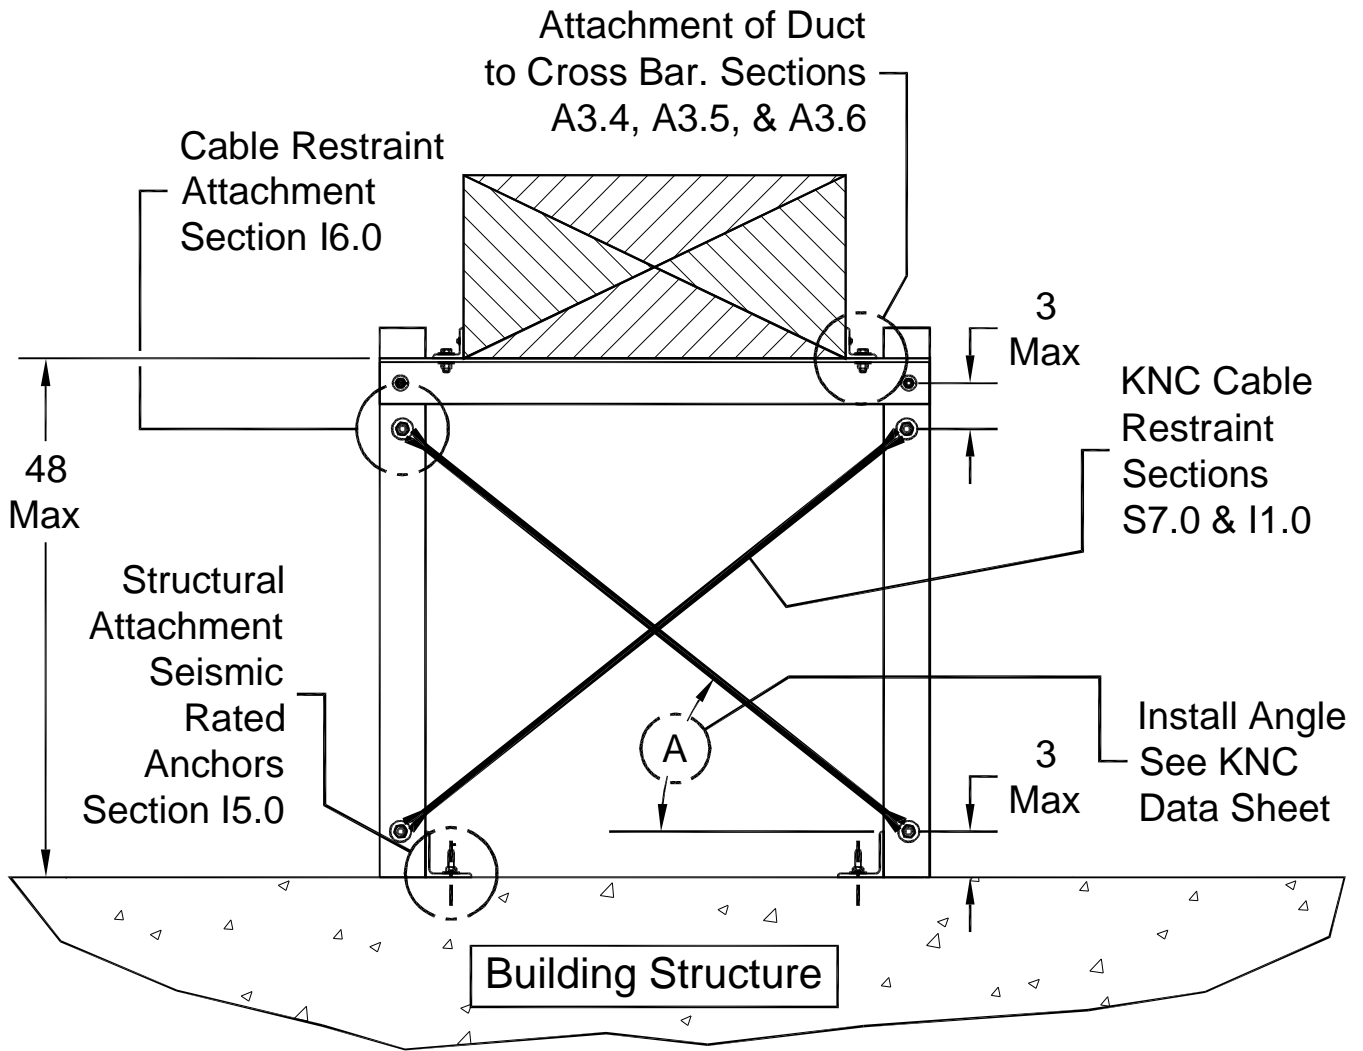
; Transverse (T) Cable Restraint Schematic Arrangement for Floor or Roof Mounted Duct – Two Restraints Attached to the Vertical Legs Acting as Cross Braces – The Anchors Attaching the Stand to the Floor Must be Seismically Rated Cracked Concrete Anchors with a Current ICC-ESR Number
